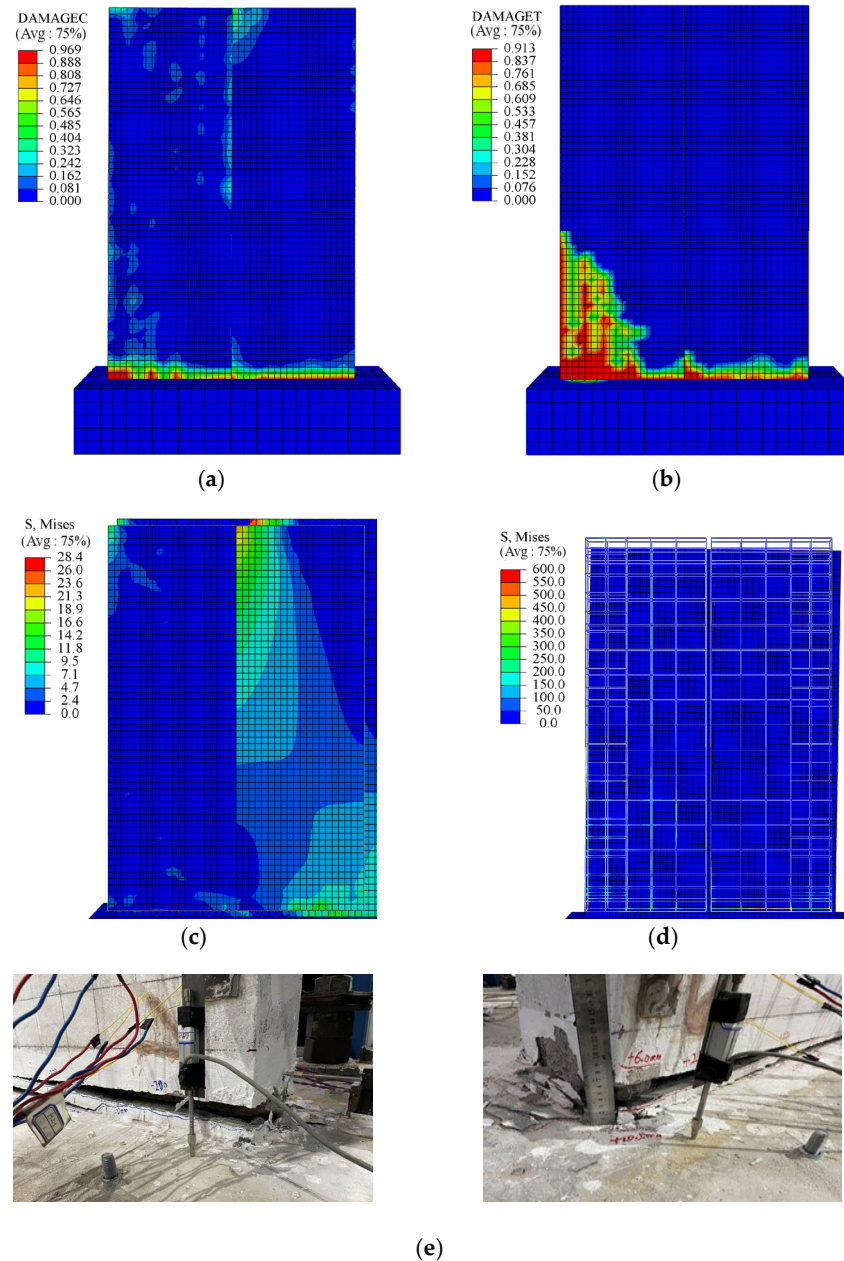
Failure models of PW1: (a) tension damage; (b) compressive damage; (c) strain of concrete (d) strain of reinforcement; and (e) actual damage in test.
